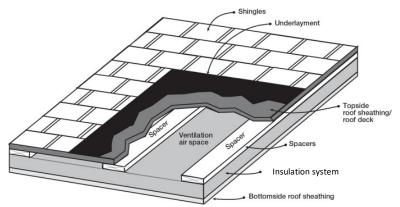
Figure B: Vented roofing assembly created by installing spacers between the rigid insulation and the nailable roof deck sheathing
